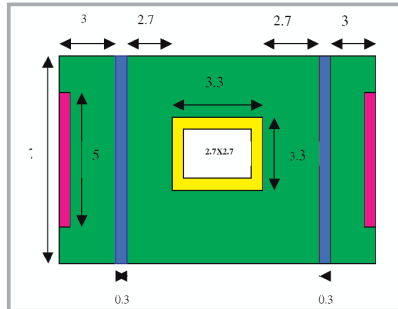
A view of a floor in the structure. Shear walls are labeled as purple, coupled shear walls are in blue, diaphragm in green and lift core in yellow. Void is left as white
